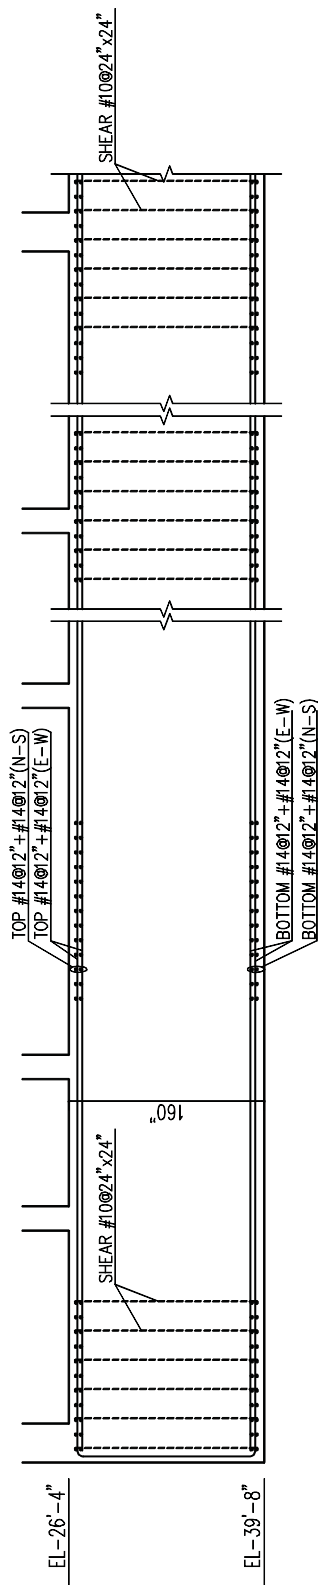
Typical Reinforcement for R/B Complex around Periphery of Basemats
